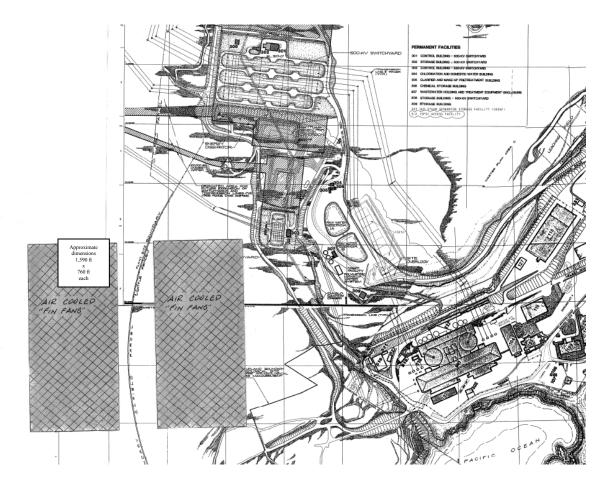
Conceptual Plot Plan Mechanical (Forced) Draft Dry/Air Cooling Towers
